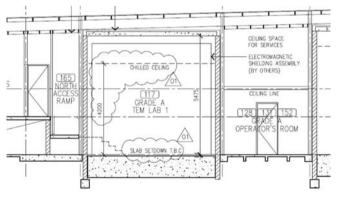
Cross section through an A Class Lab showing isolation between floor slabs, masonry walls and the inner laboratory floor slab.
